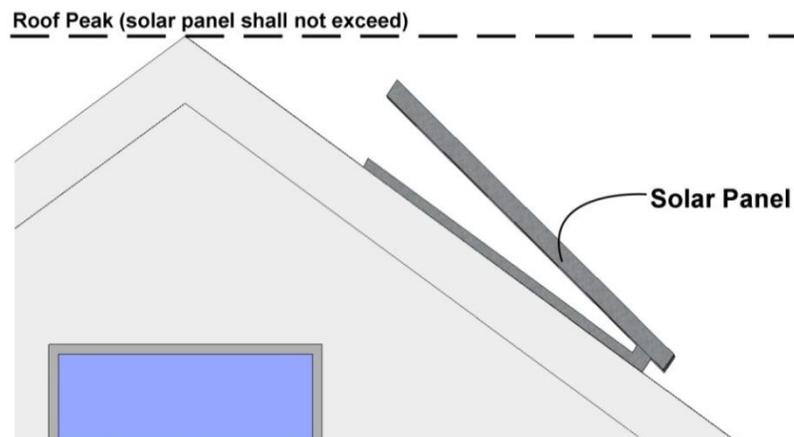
Solar Collector Projection Above Roof Peak
